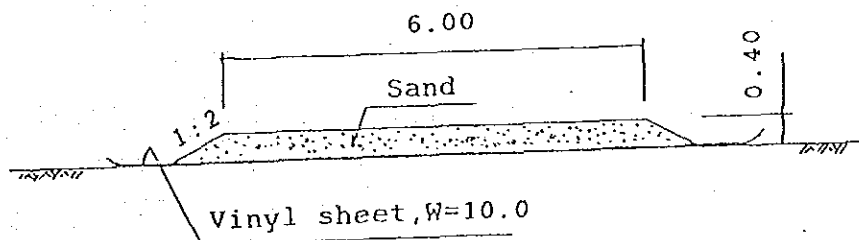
(A) Typical Section of Access Road (Type 1)
